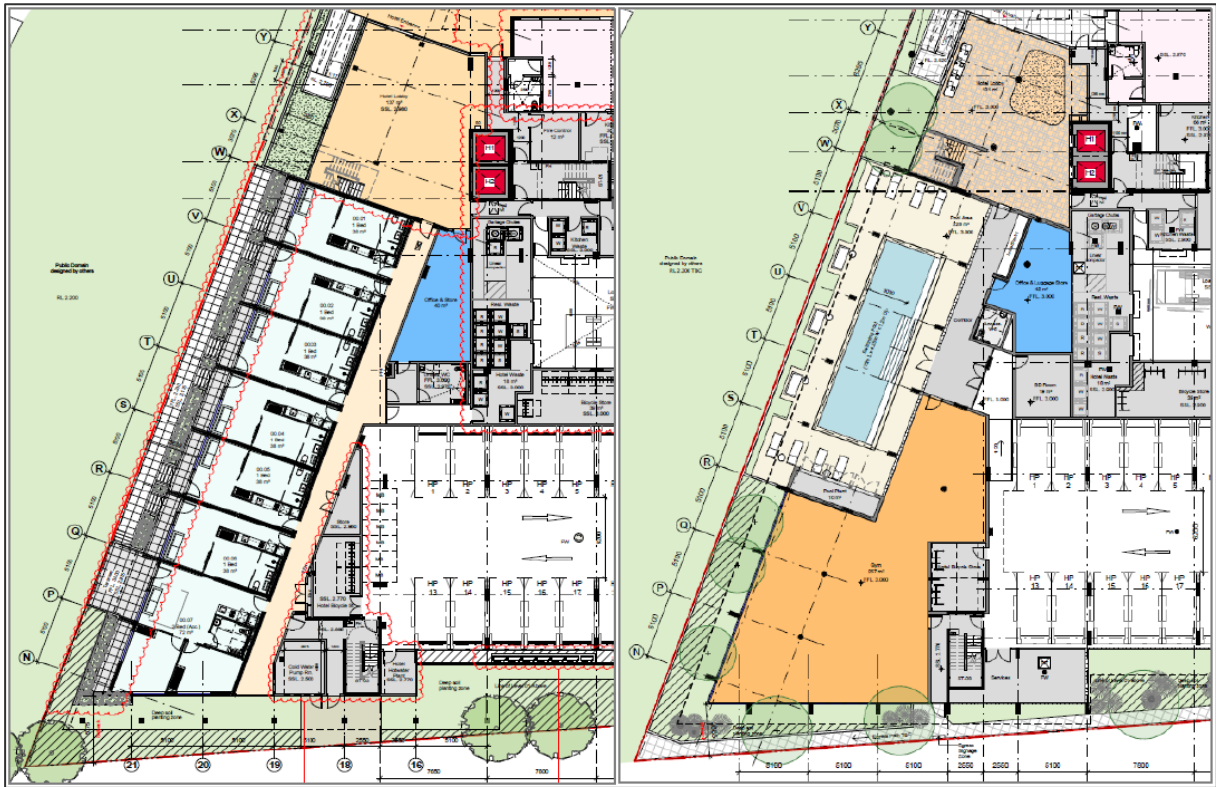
| Ground floor plan approved (left) and proposed (right) (Source: Applicant's Application)
